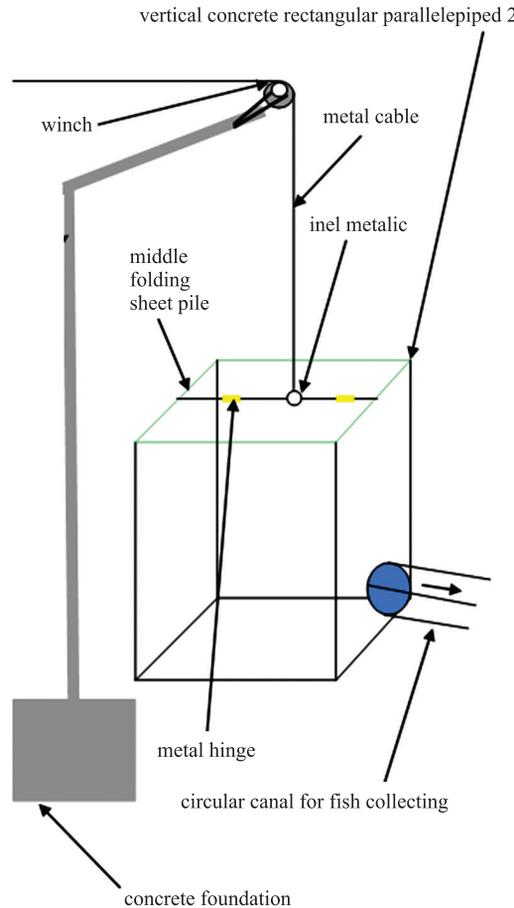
Positioning the concrete pile situated downstream of the discharge sill – indicative scheme
